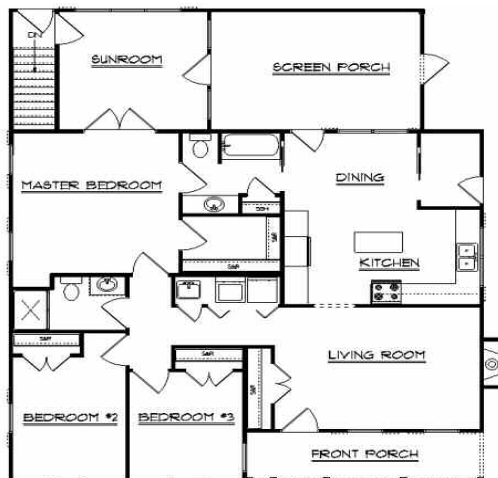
Floor Plan of Typical Midrange U.S. Home (plan produced for research project)
